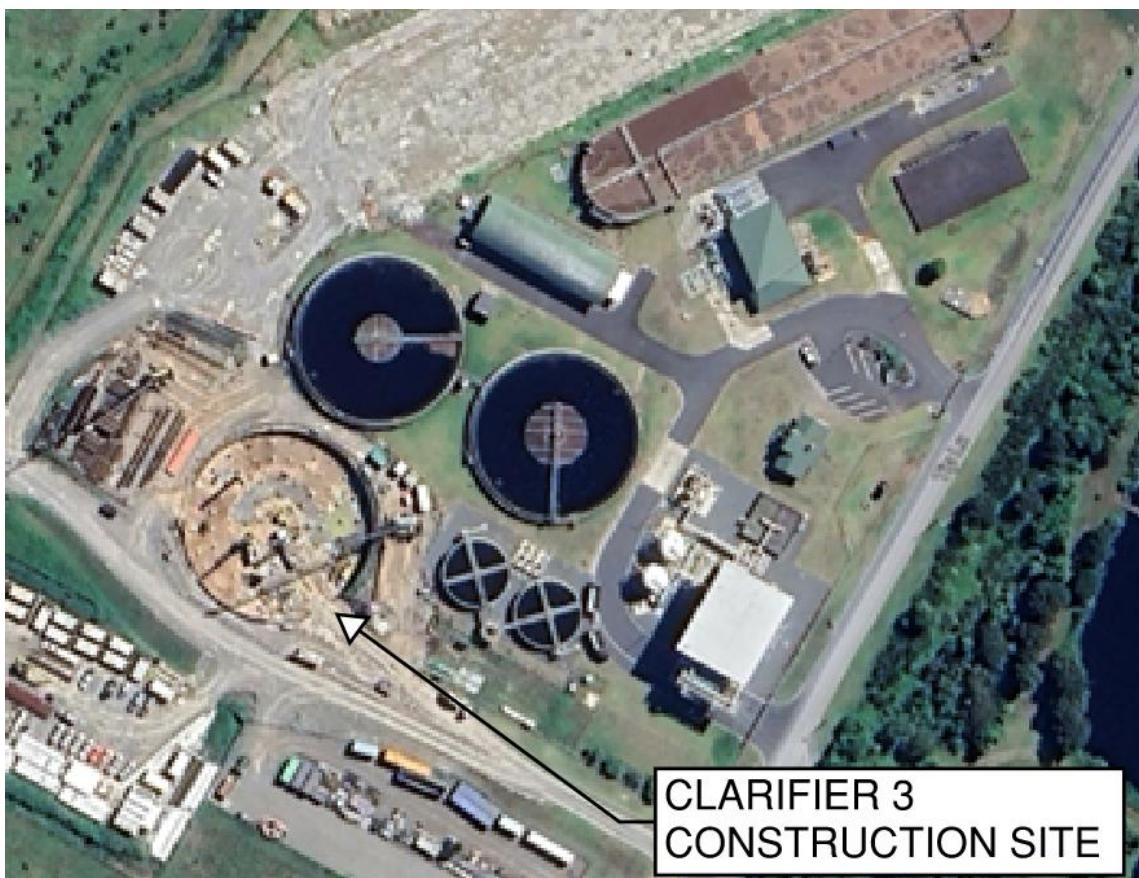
Satellite aerial photo of the Te Maunga Clarifier 3 during construction (Google, 2024).
